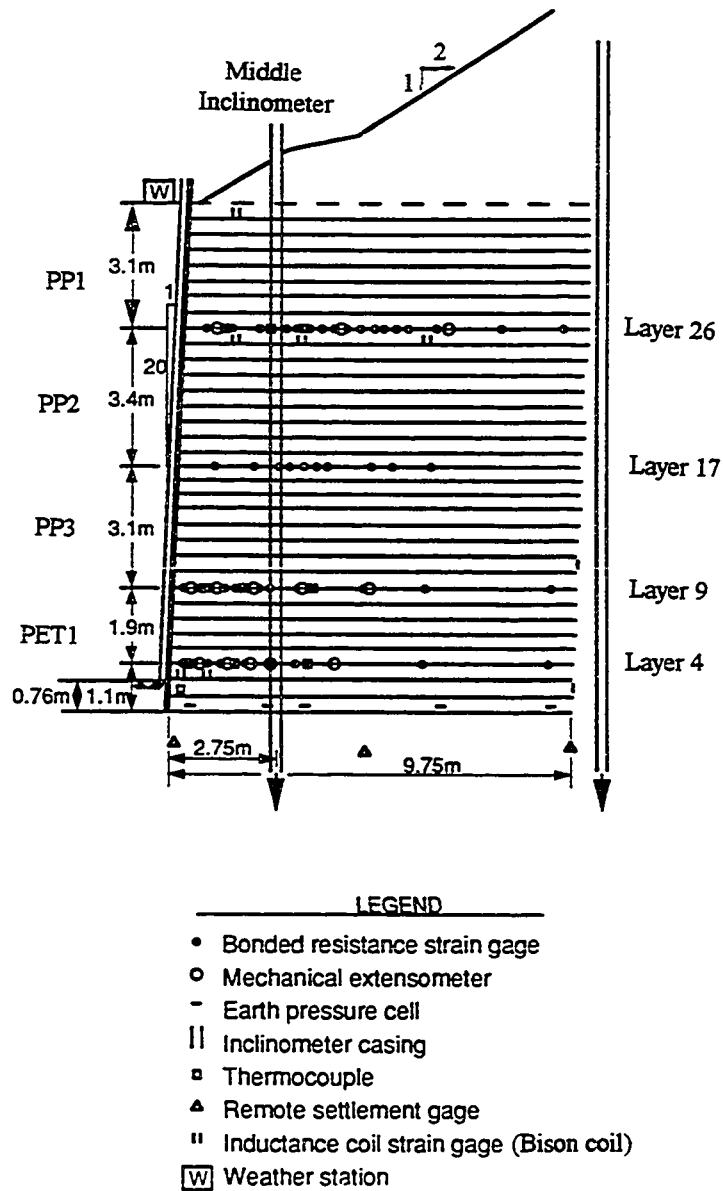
Vertical cross section of Rainier Avenue wall showing reinforcement and instrumentation (after Allen, et al., 1992).
